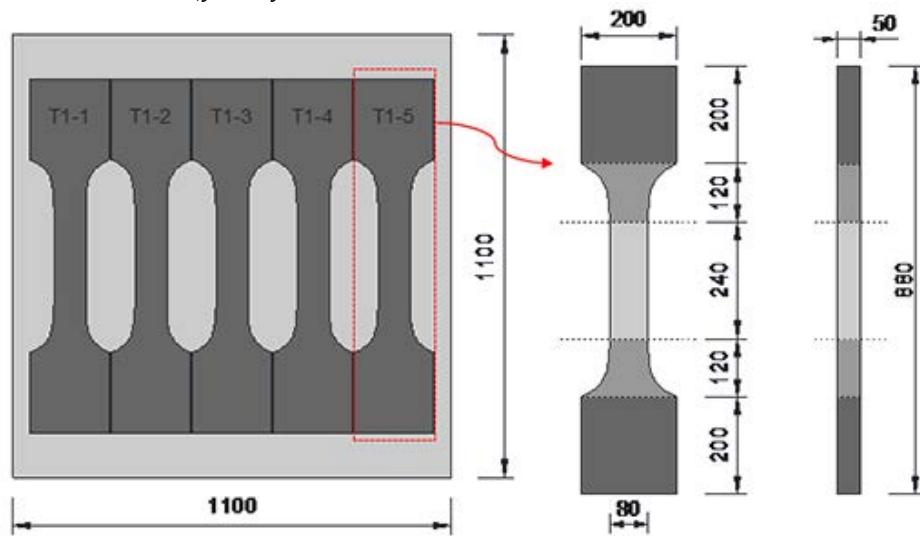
Dumbbell specimens for DTT cut from quadratic slab element (unit: mm)
